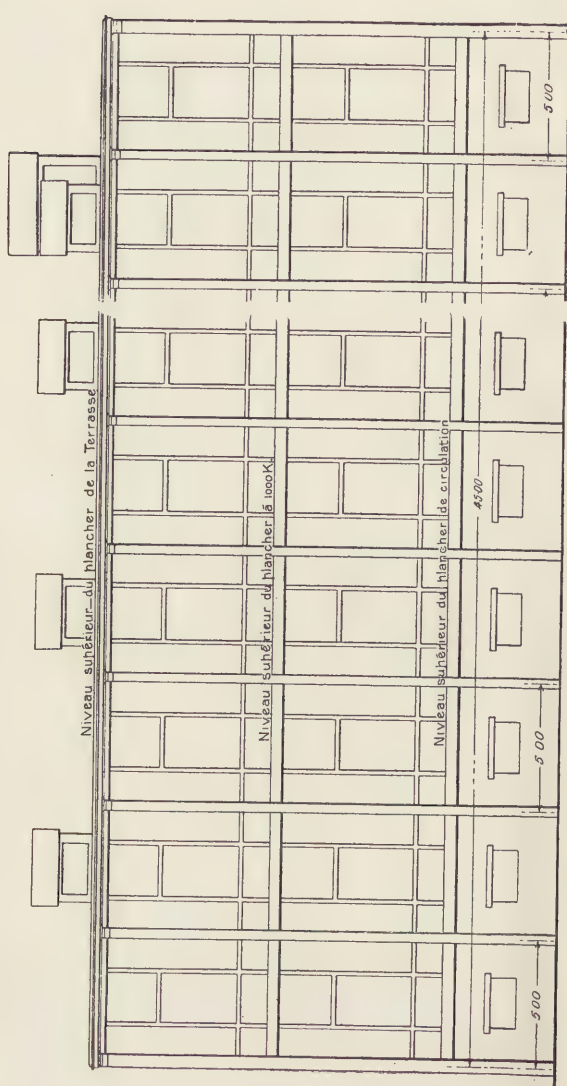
Gennevilliers Gasworks. Front Elevation of one Storehouse.
